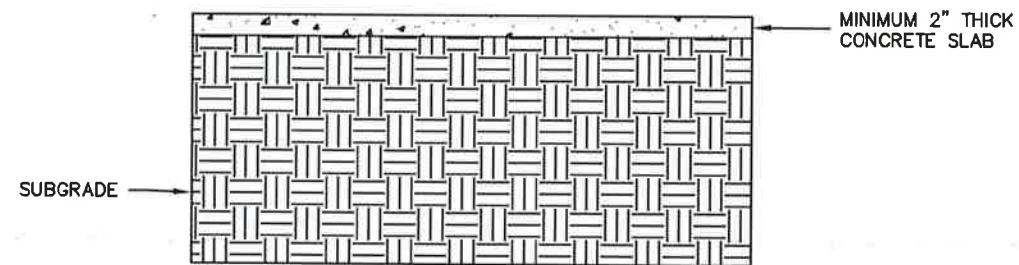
TYPICAL BUILDING FOUNDATION SLAB COVER SYSTEM DETAIL
